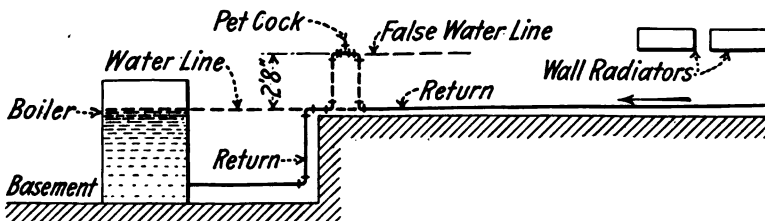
LOCATION OF SEAL TO AVOID UNSTEADY WATER LINE IN BOILER.
